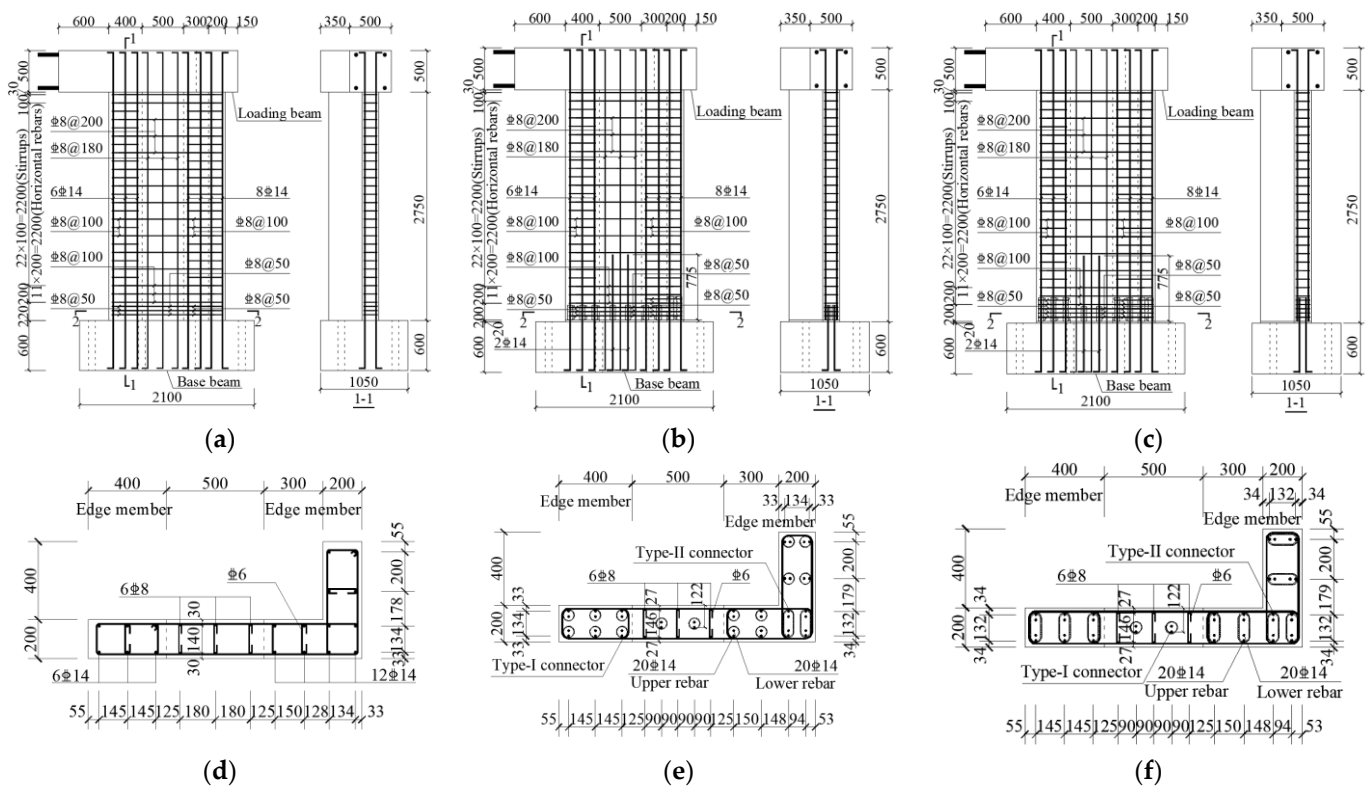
Dimensions and reinforcements of specimens (a) Facade of LSW, (b) Facade of LAPC-1, (c) Facade of LAPC-2, (d) Section of LSW, (e) Section of LAPC-1, (f) Section of LAPC-2.
